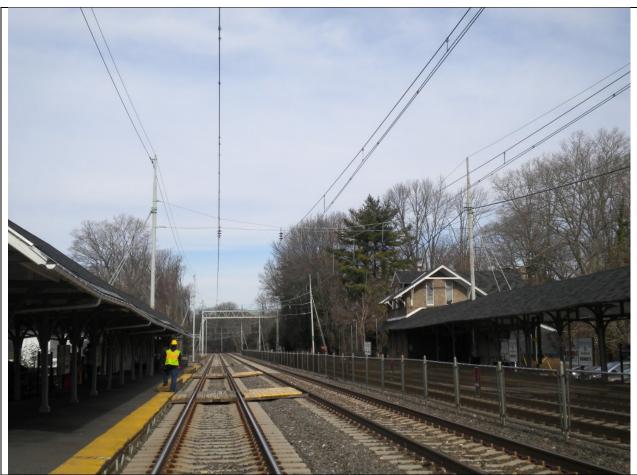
Harrisburg Line, milepost 9.28, west of Haverford, looking west at existing structure P-79. HSHD is on both sides, north (right) and south (left) of the railroad. Photograph taken 12/5/2012.
